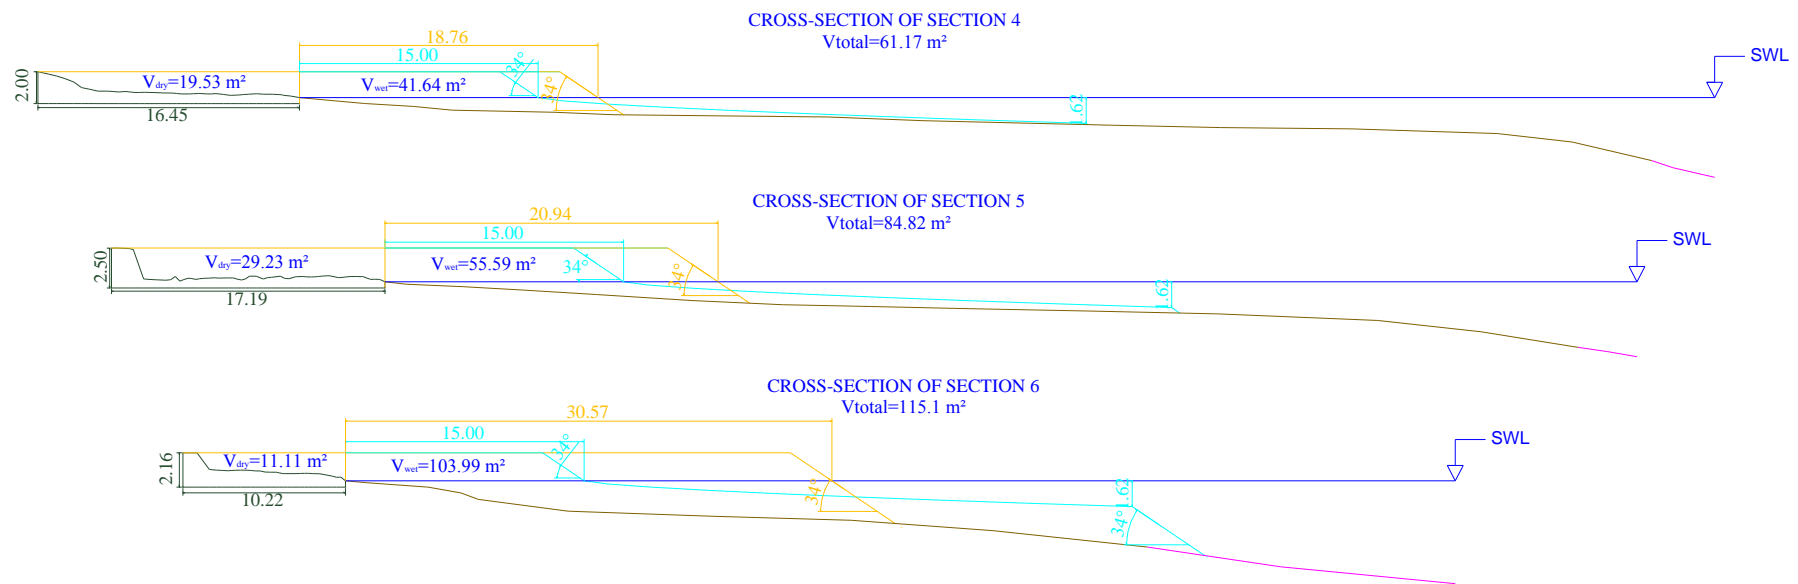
Design profiles of Section 4,5 and 6 for 15 m new dry beach width ($D_{\text{fill}}=0.45 \text{ mm}$).
